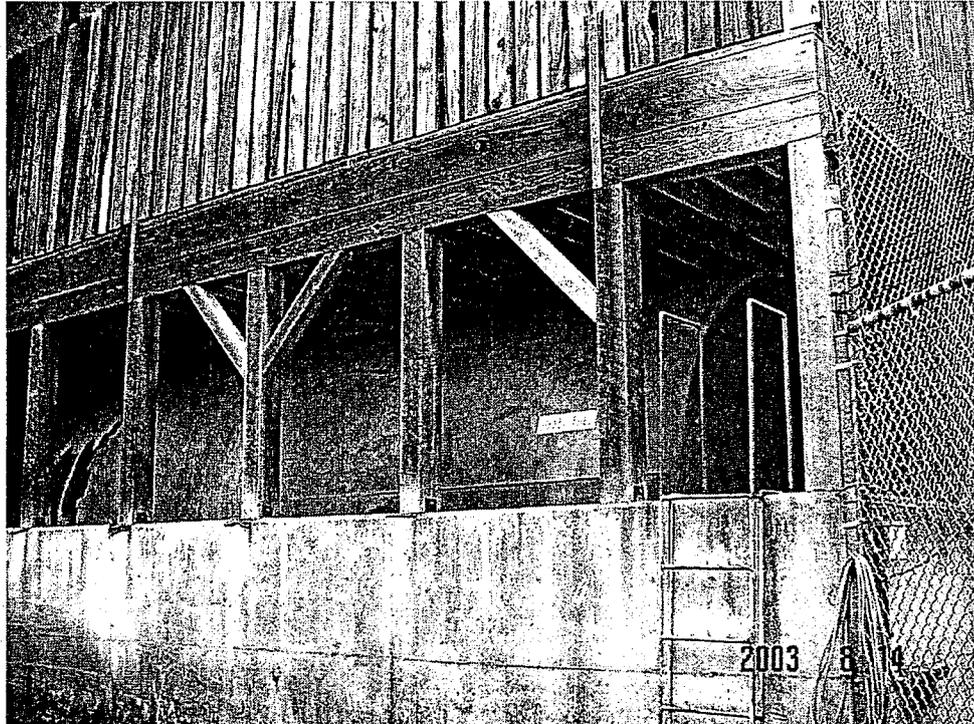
EXISTING 15,000 GALLON FUEL STORAGE TANK AND CONTAINMENT
